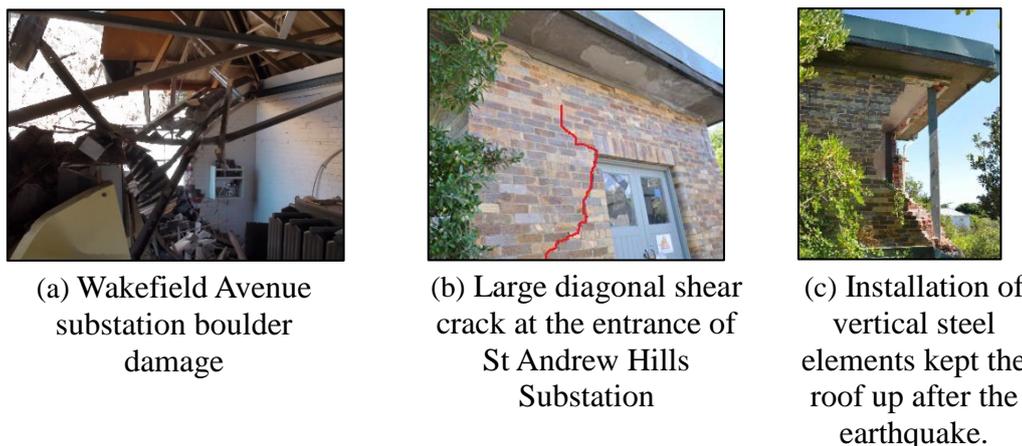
Heavy damage to Wakefield Avenue and St Andrew Hills substation buildings
